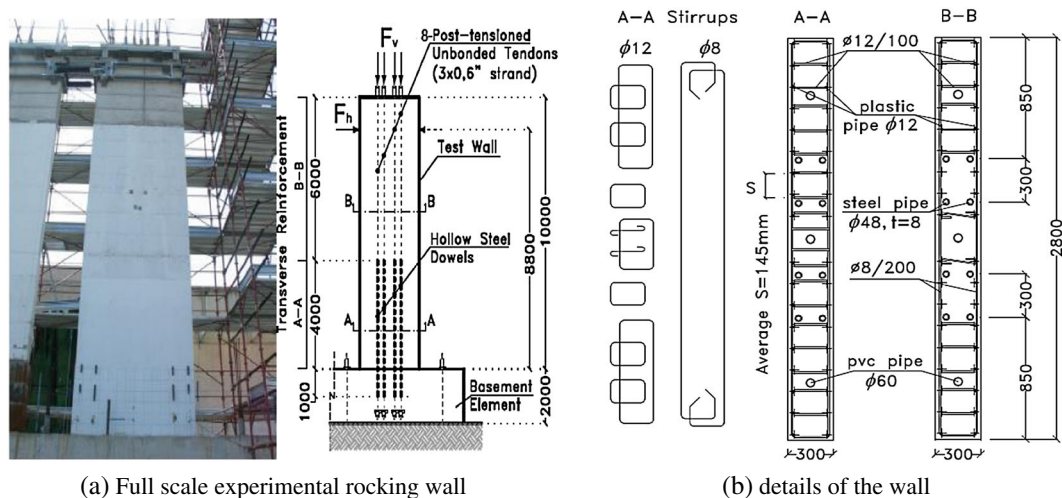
(a) Full-scale experimental rocking wall. (b) Plan of wall.
